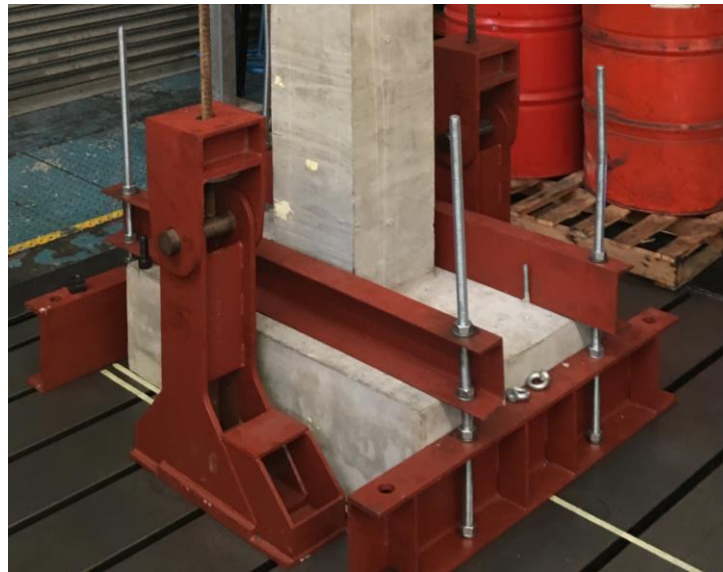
Sliding and overturning restraint beams, and the vertical press frame connection to the test floor
